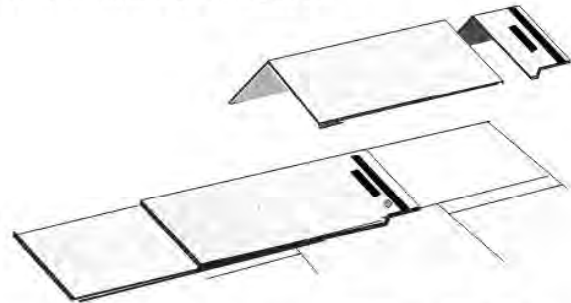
EZ-Ridge™ Shingle Cut to Create an End Cap
